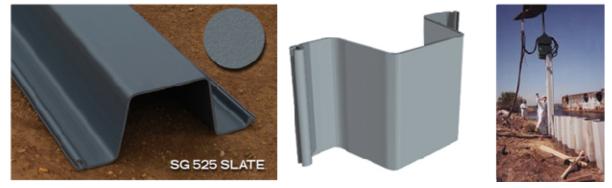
Example of the metal sheet piling. Both the material and the construction is expensive.
